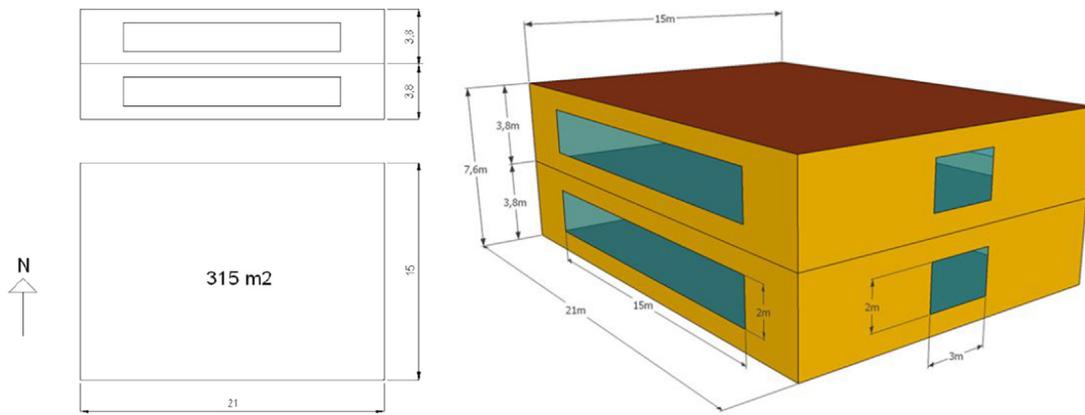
Floor plan and north-south view of the building model based on the IEA Task 38 (left) and 3D model (right).
